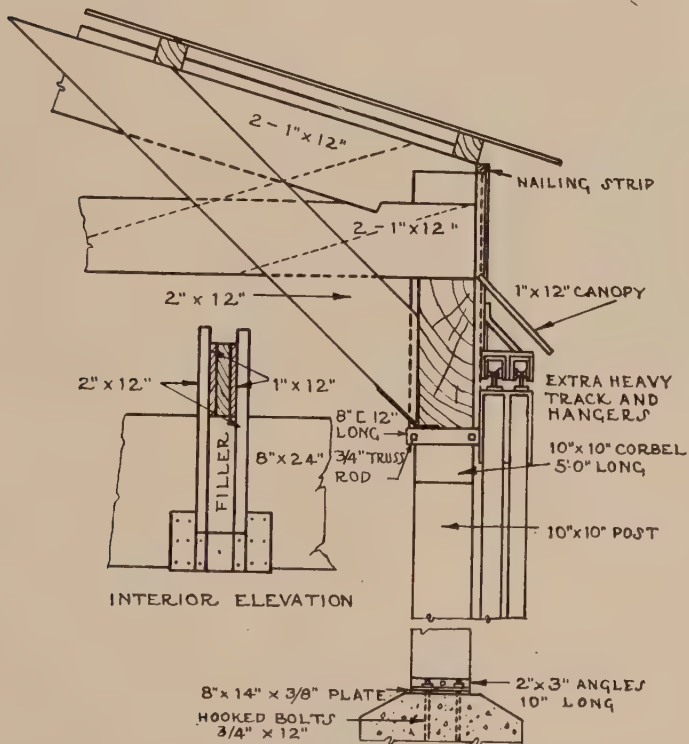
Detail of roof connection and post anchorage of Howe truss shown in Fig. 125.
